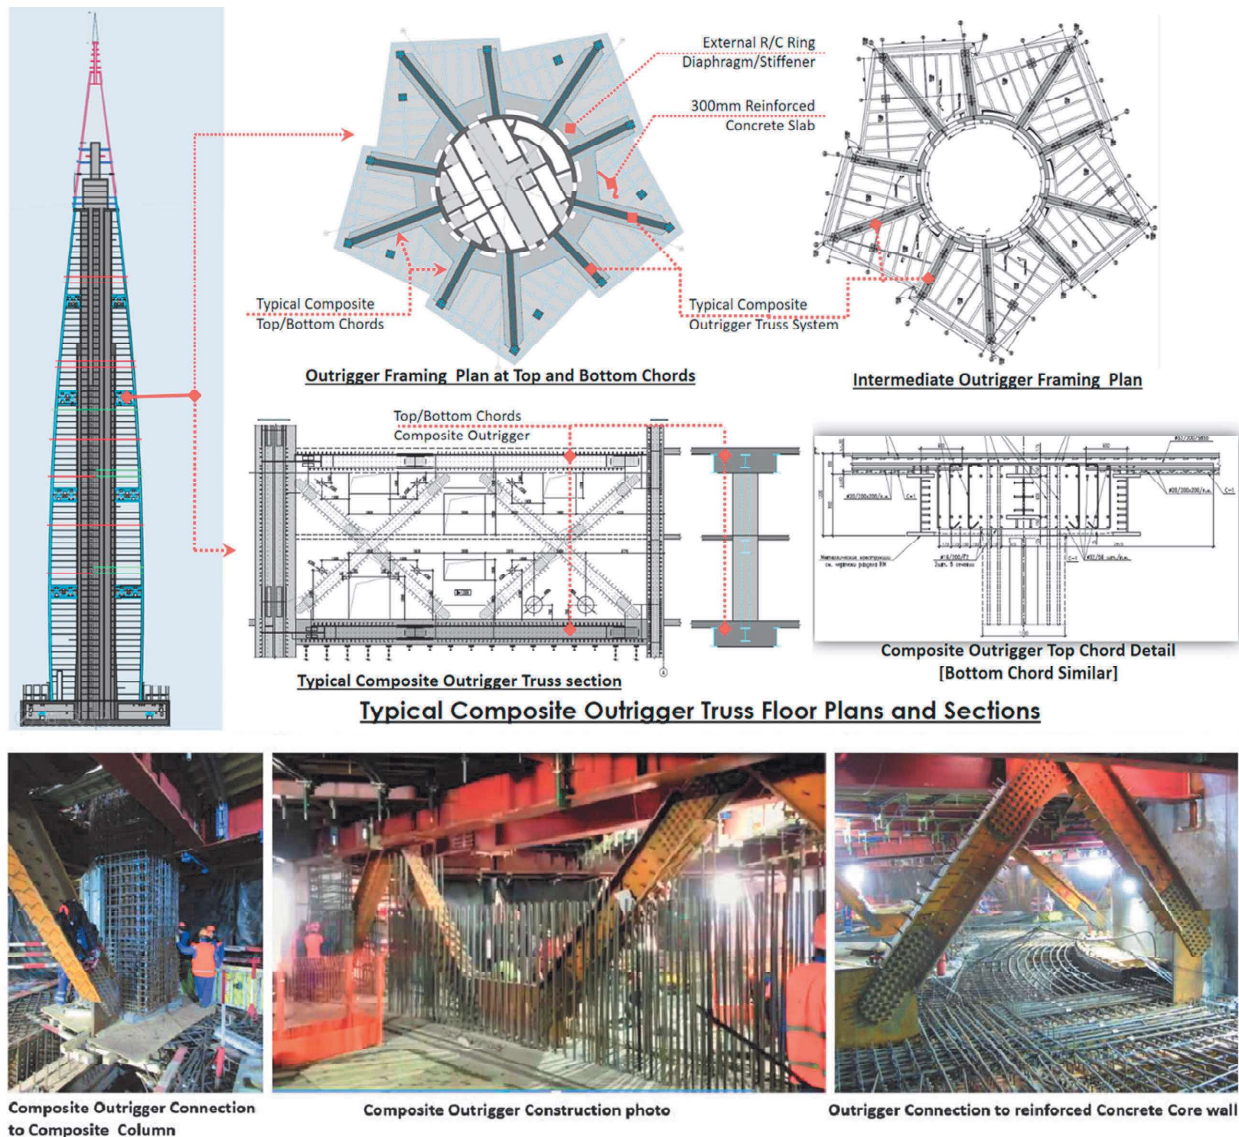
Typical composite outrigger plans, Sections, details, and construction photos.
